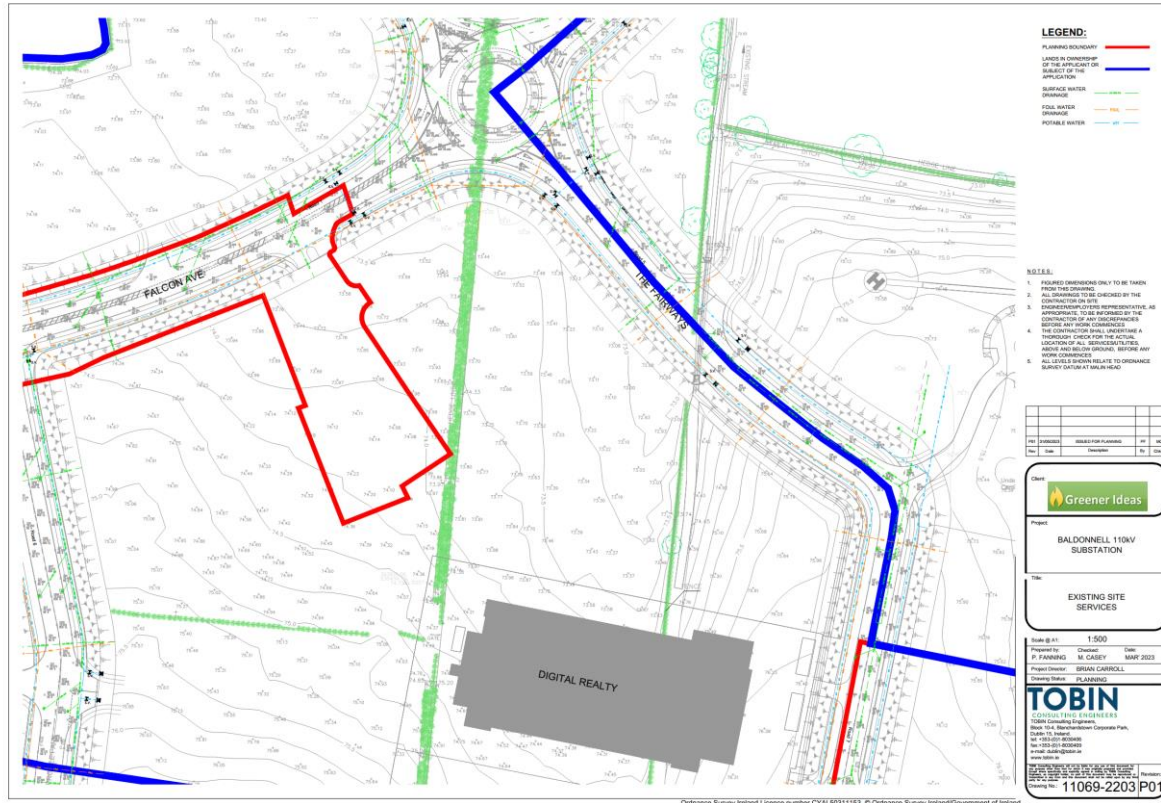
Existing Services Layout, Drawing 11069-2203
